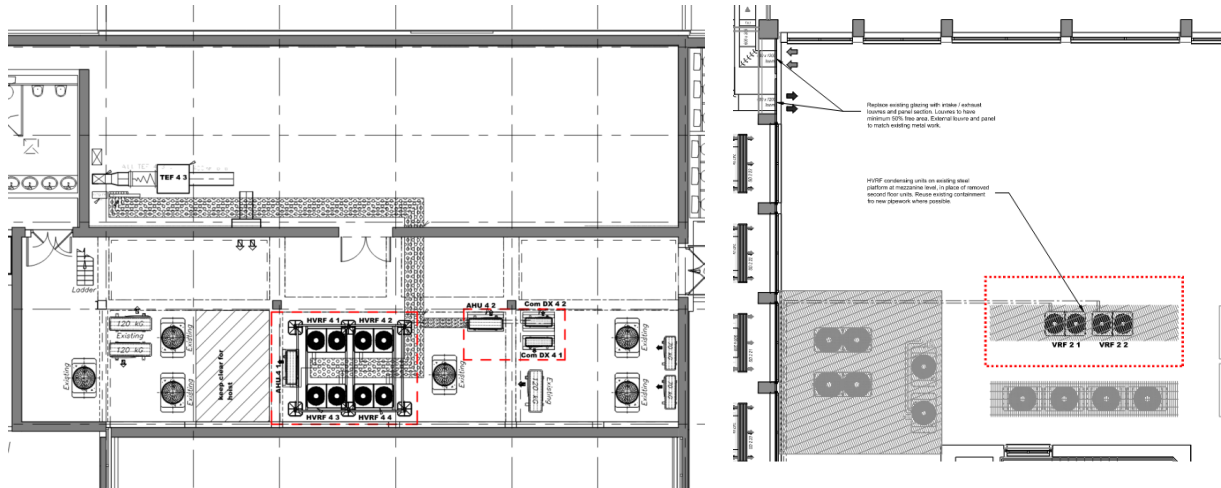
2 Proposed fifth floor plan – proposed location for new plant items (highlighted in red)
